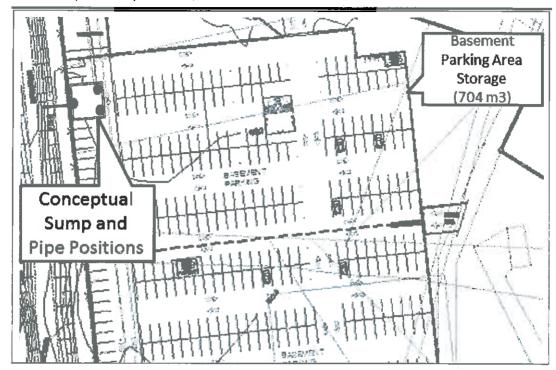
Conceptual Plan View of the Basement Level SWMP Infrastructure
